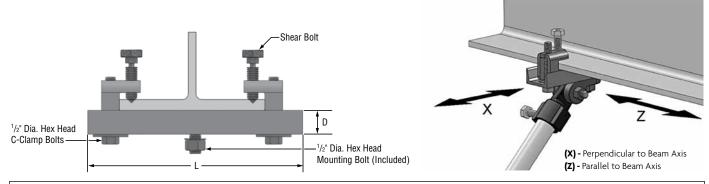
UL MAX LOADS: LOADS (LBS) • WEIGHT (LBS) • DIMENSIONS (IN)
